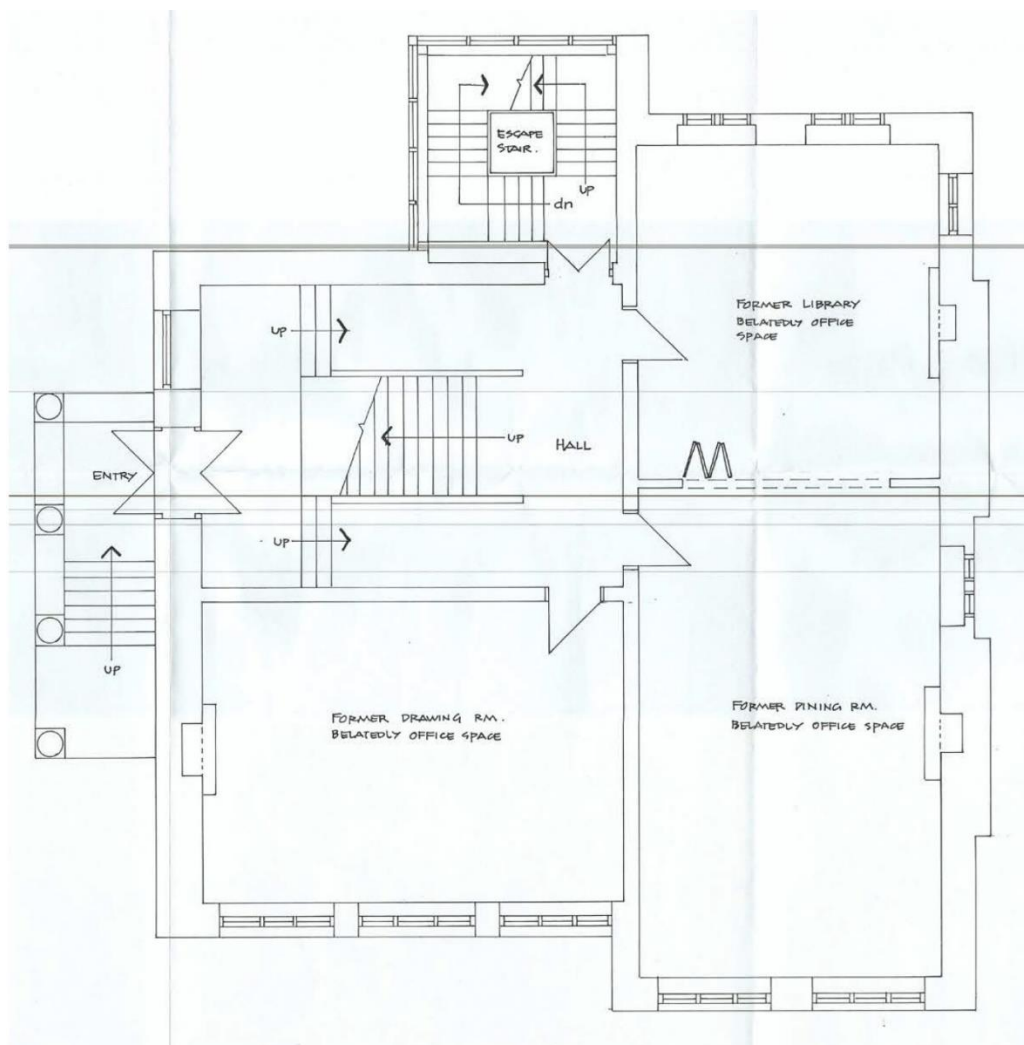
Ground floor plan, 1998, by Clive Hill Associates. (North is to the left)
